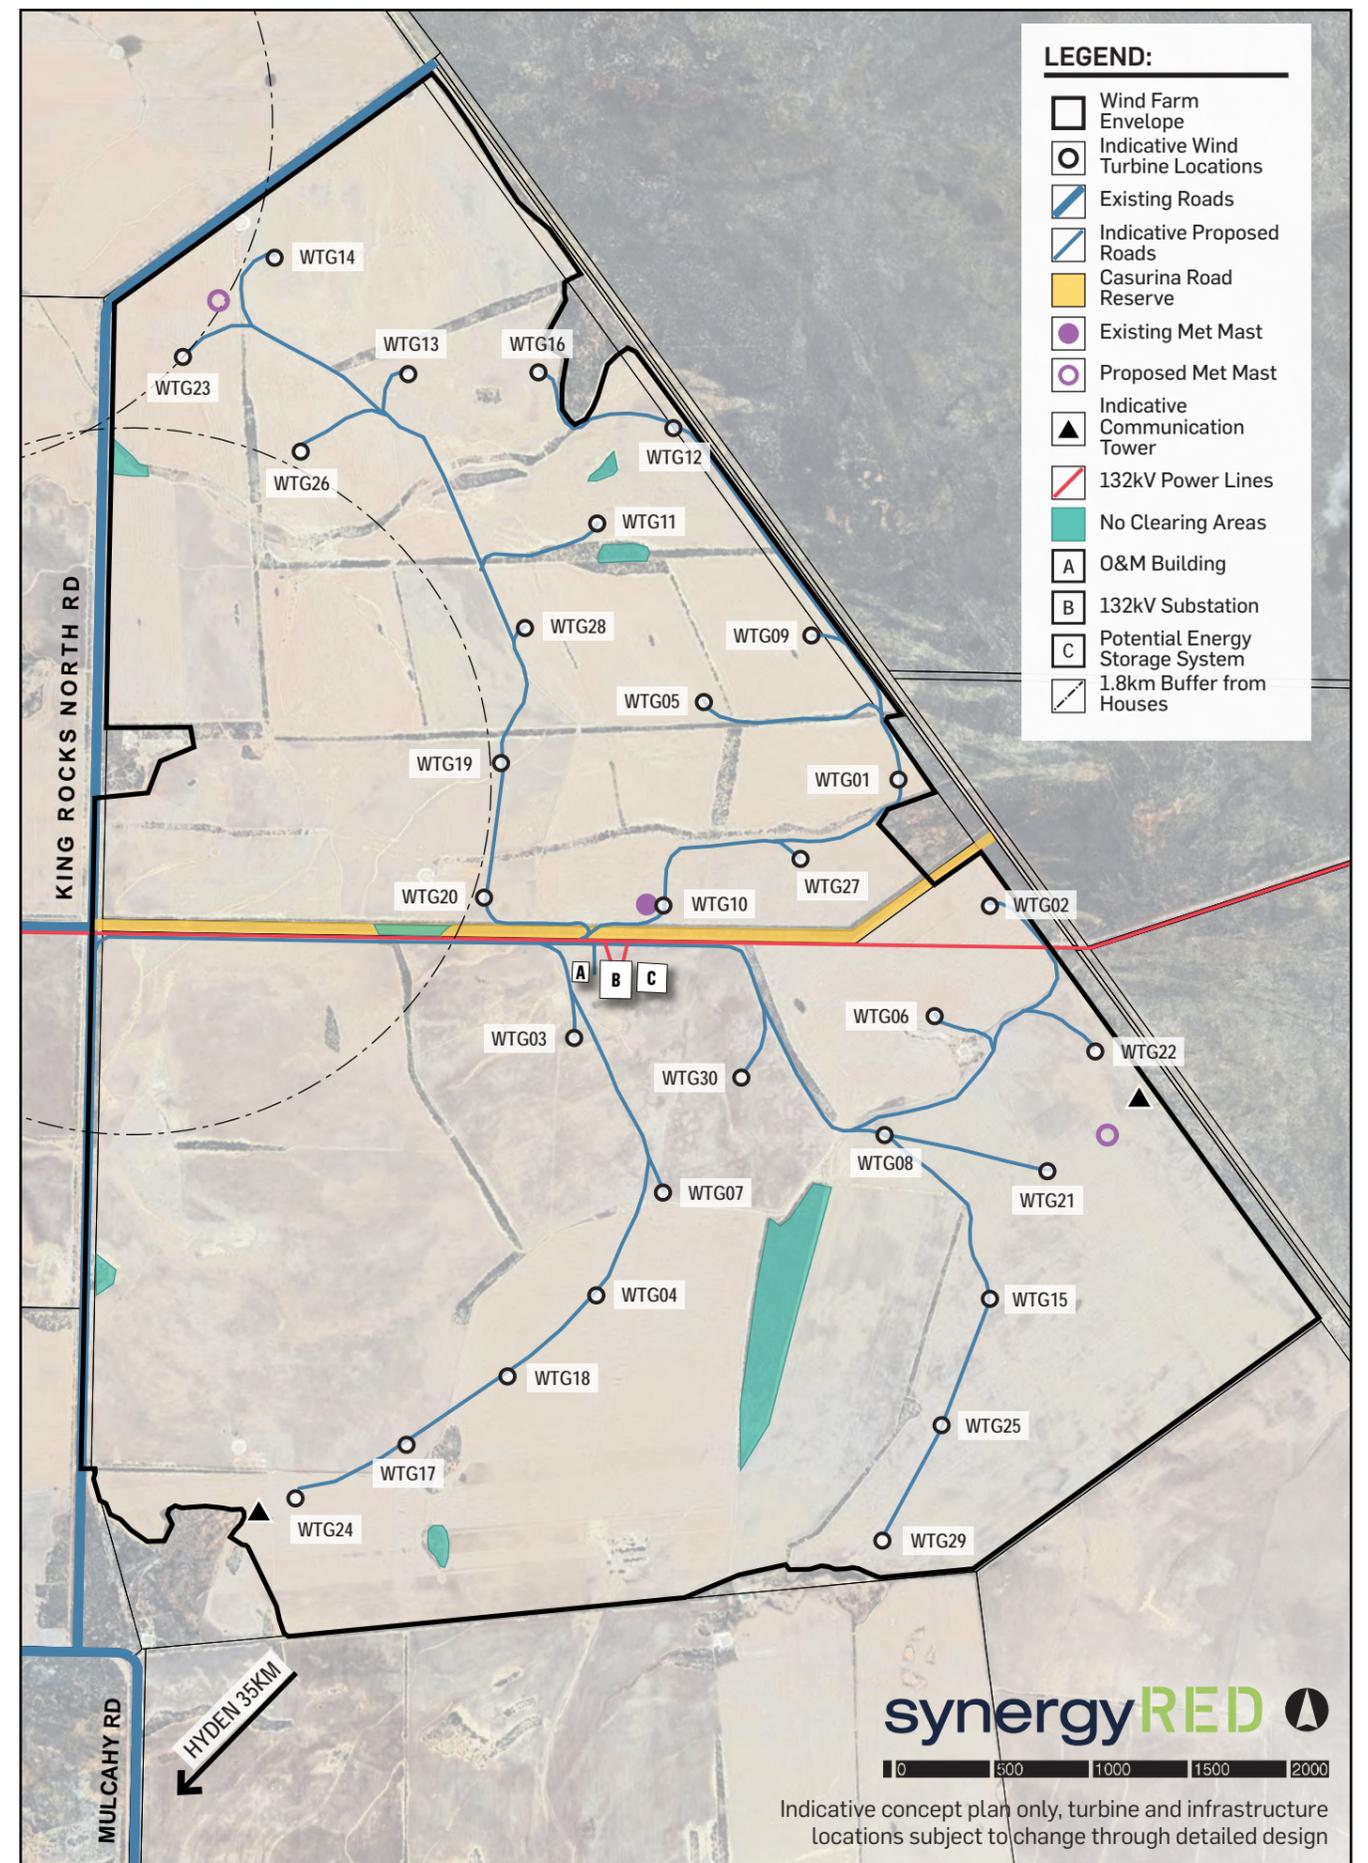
Project Site Context Plan - Proposed Turbine Locations
